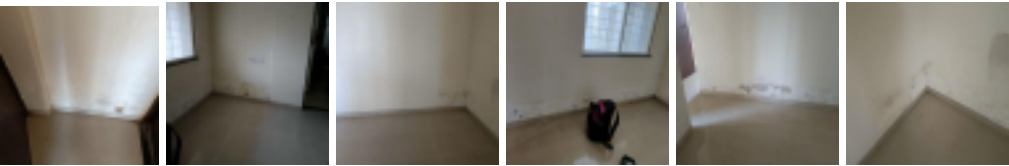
Photo 4 Photo 5 Photo 6 Photo 1 Photo 2
